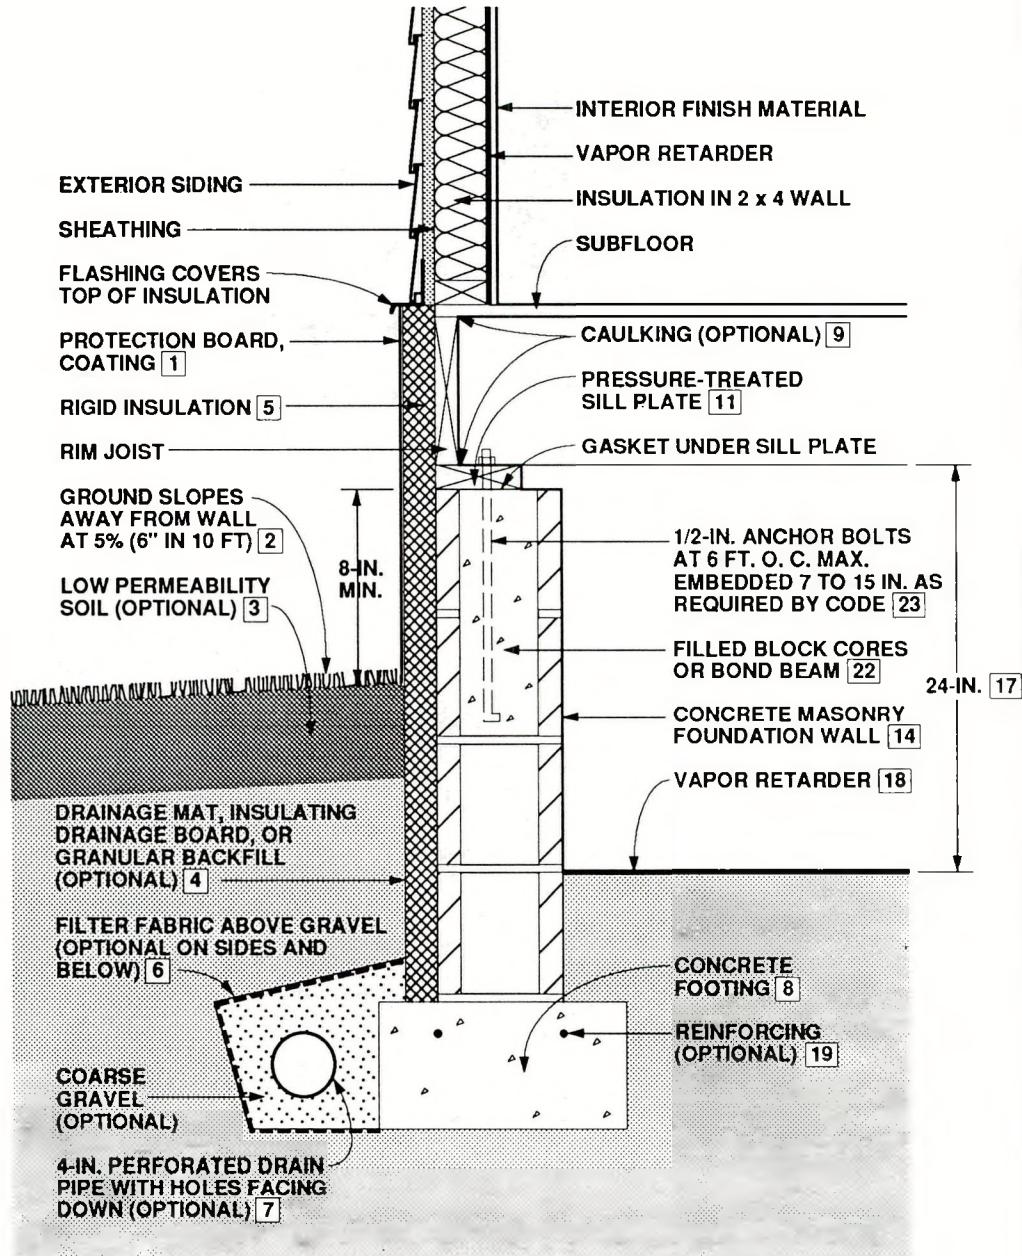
Unvented Crawl Space Wall with Exterior Insulation
